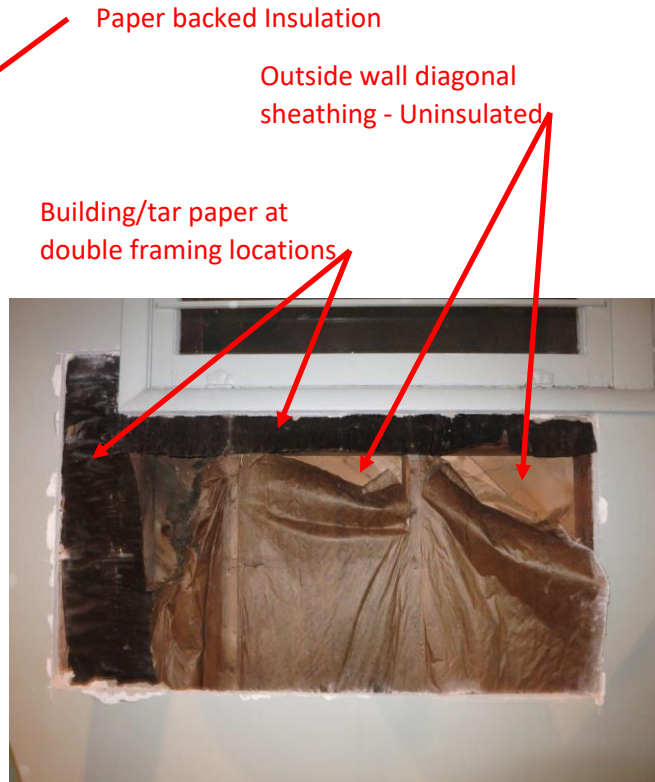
Paper-Backed Insulation and Building (Tar) Paper Form Vapour Barrier on Inside of Insulation
